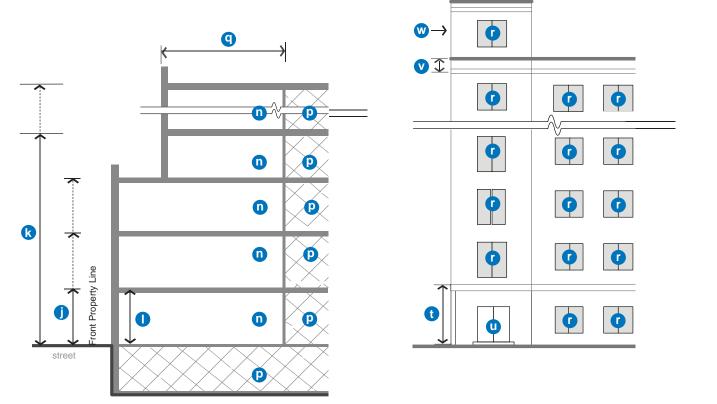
(2). General Stoop Building: Height & Use Requirements.
